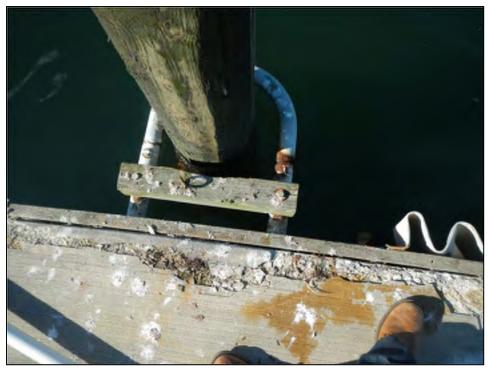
Typical existing pile hoop. Note corroded connection hardware.
